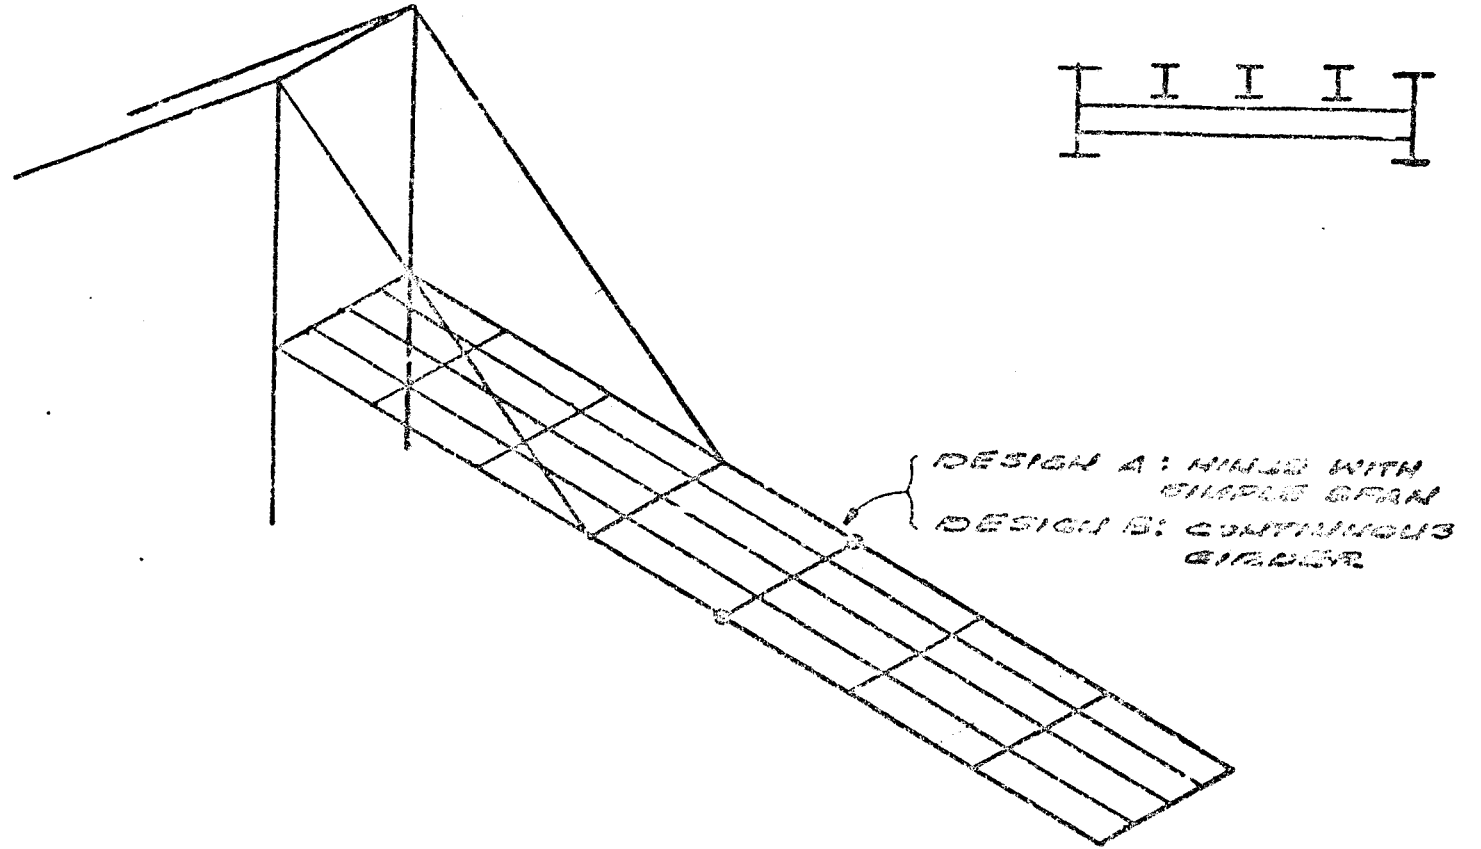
BRIDLE BRIDGE CONCEPT APPLIED TO NEW BRIDGE CONSTRUCTION
